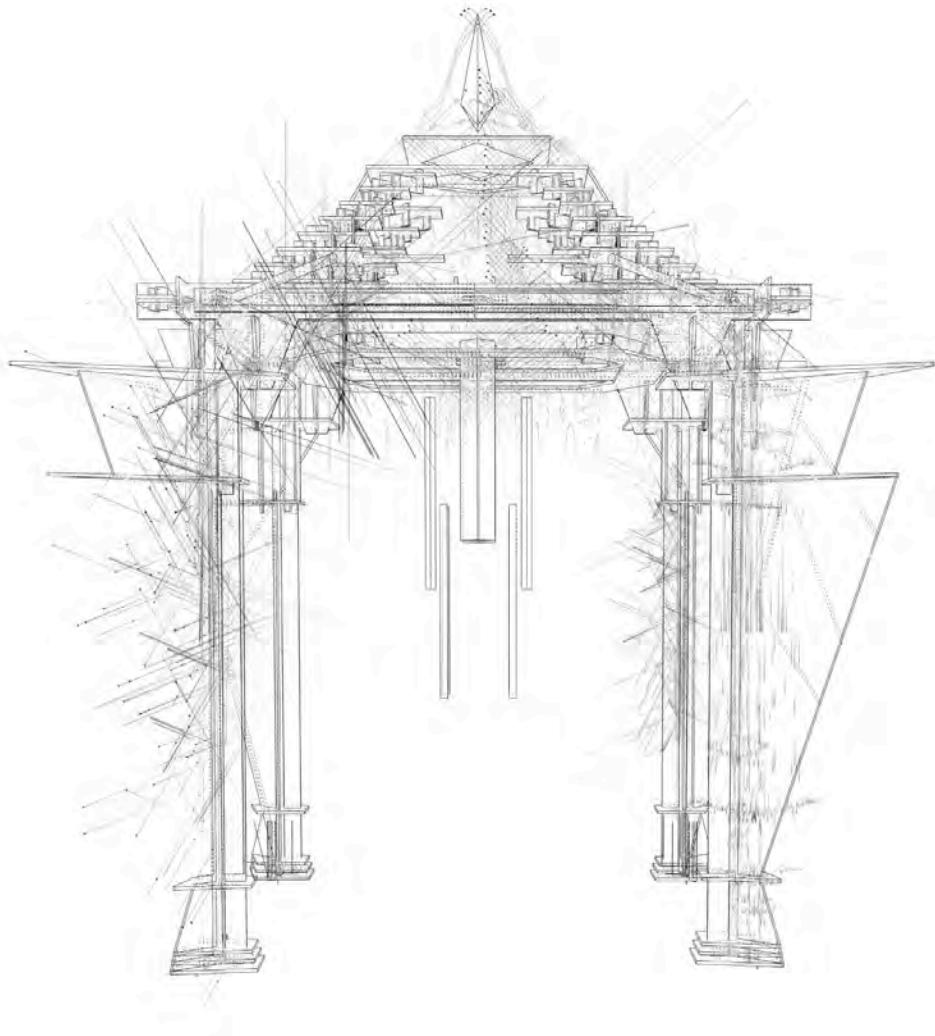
Perspective elevation of the Allotope Krotona Pavilion
